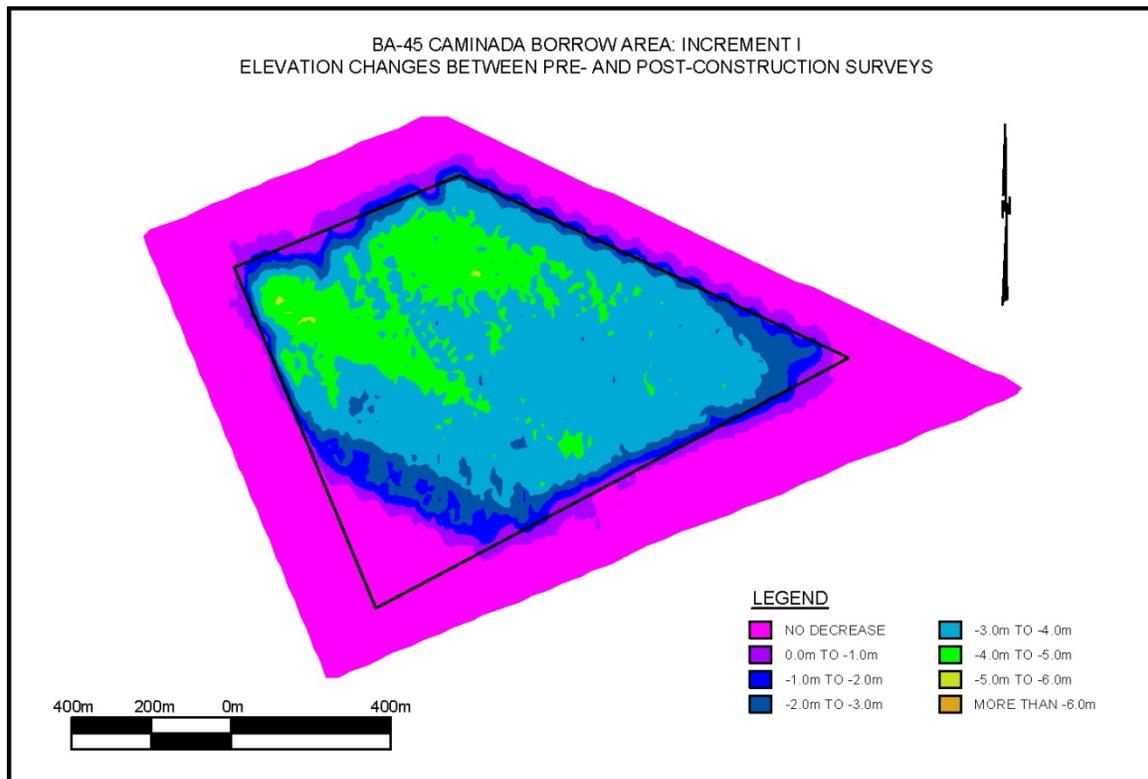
BA-45 Borrow Area Elevation Changes Between Pre- and Post-Construction Surveys
